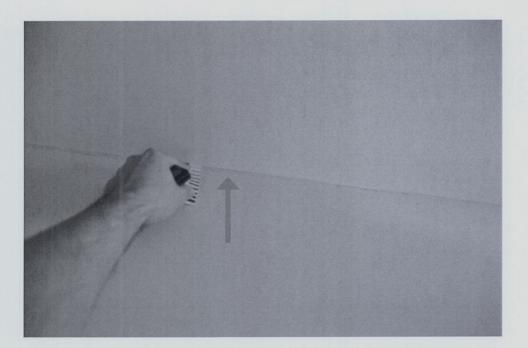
0.5mm cracking be-tween the ceiling and the right wall in the
